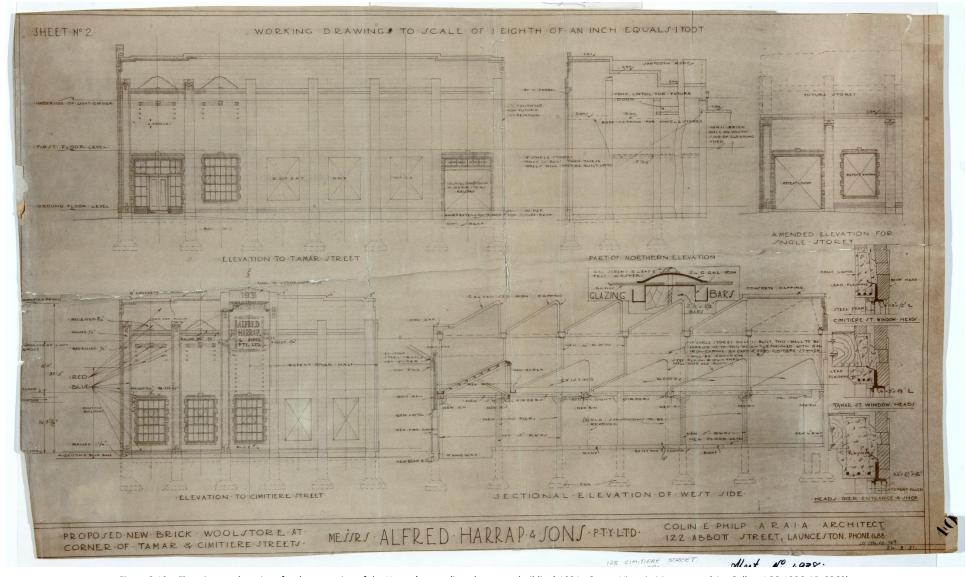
Elevations and sections for the extension of the Harrap's store (i.e. the corner building) 1931. Queen Victoria Museum and Art Gallery LCC-1996-AD-0369b
